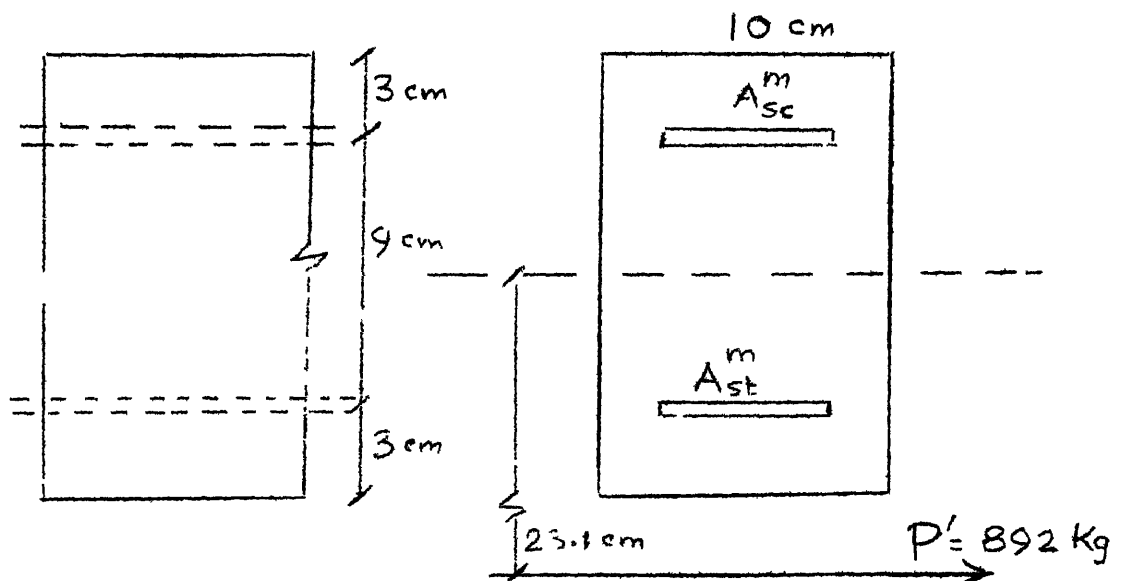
EXTRA REINFORCEMENT AT THE JOINT ON BEAM-SIDE.
